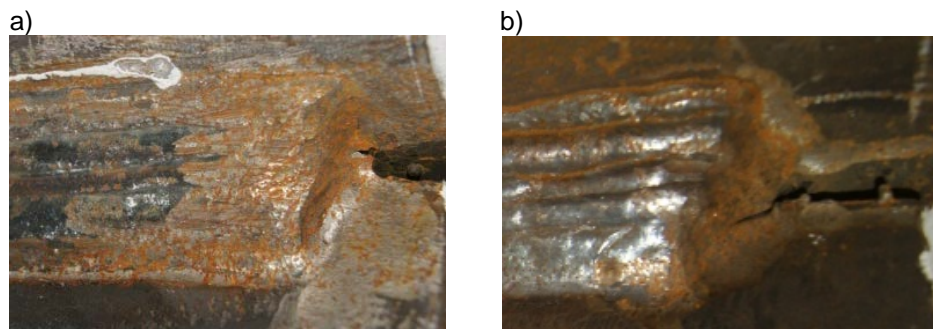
Initiation of tube-to-gusset plate weld fracture: a) Specimen 2, b) Specimen 4
